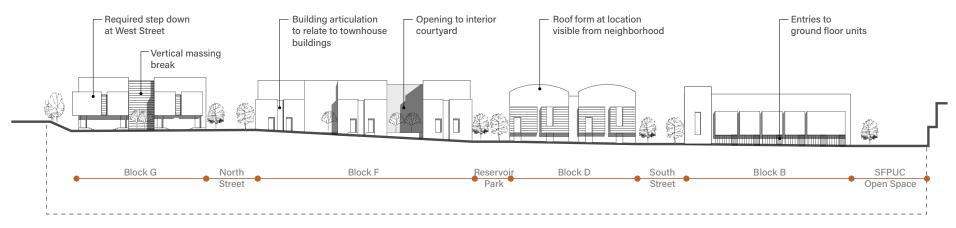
Conceptual Streetwall Character - East Side of West Street
